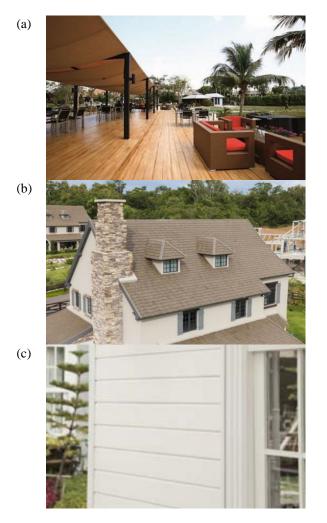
Examples of the outdoor applications of fibercement composites (a) floor (b) roof and (c) wall [1]
